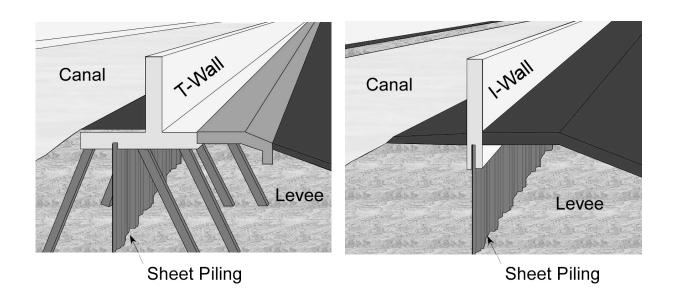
T-Wall and I-Wall, Three-Dimensional Sections
